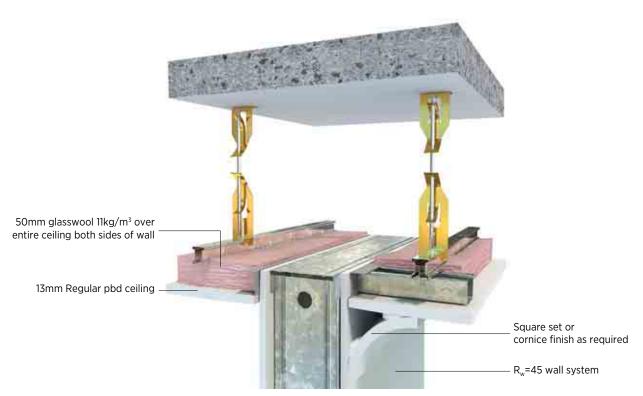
Ceiling configuration to maintain an  $R_w$ =45 wall acoustic rating (System OP.9 shown)
